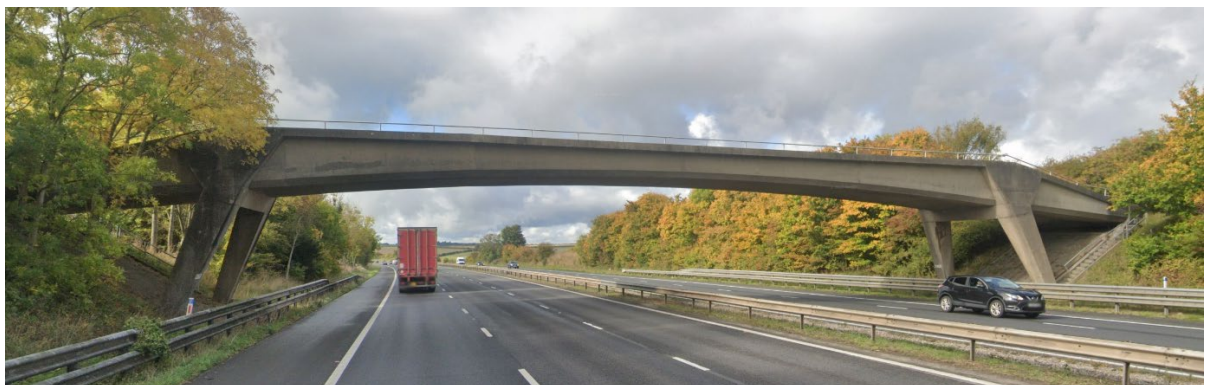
Example of a steel precast concrete beam footbridge
